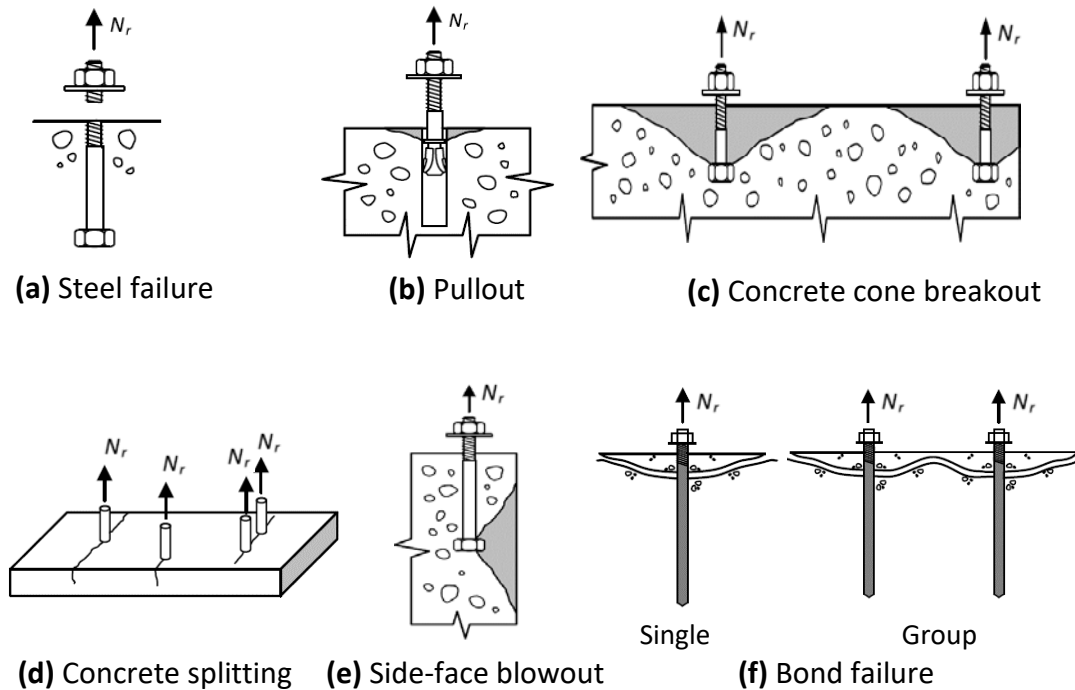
Failure modes of headed anchors subjected to tension load (ACI 318-19).
